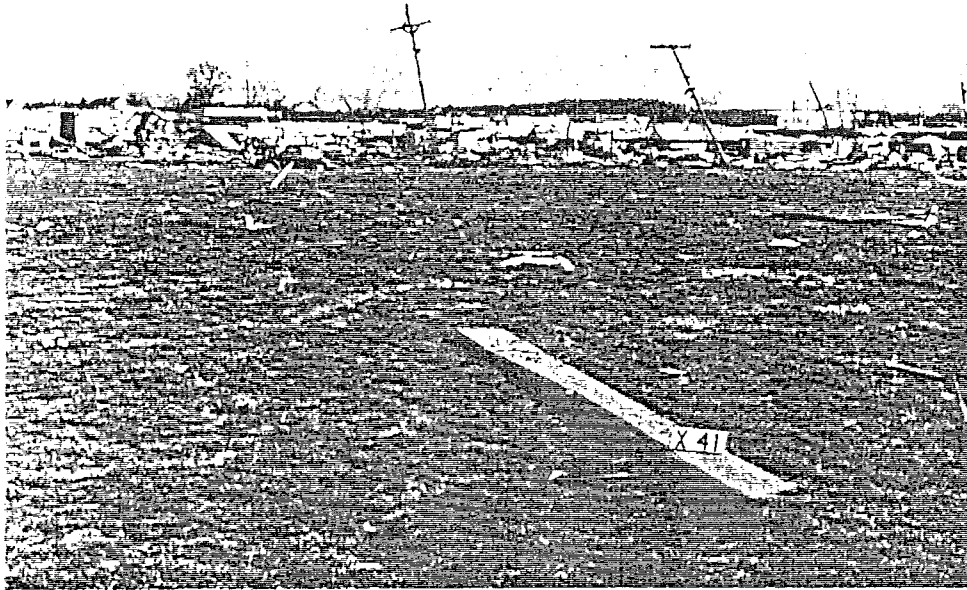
TIMBER BEAM. The beam, 3 x 13 in. in cross section and 20 ft long, was uplifted from the roof of the gymnasium of West Jr. High School (Ref. Fig. 41) and was deposited 450 ft from its original location.
